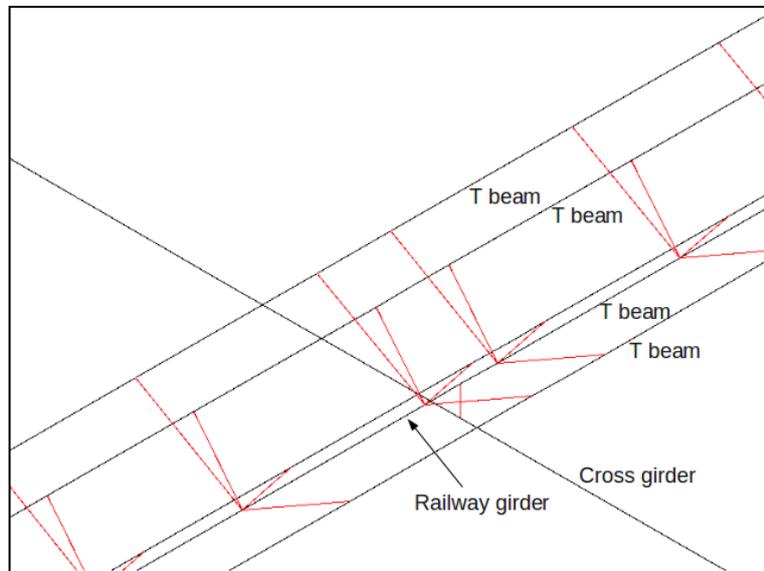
Each cross girder is rigidly connected to the railway girder beam.
